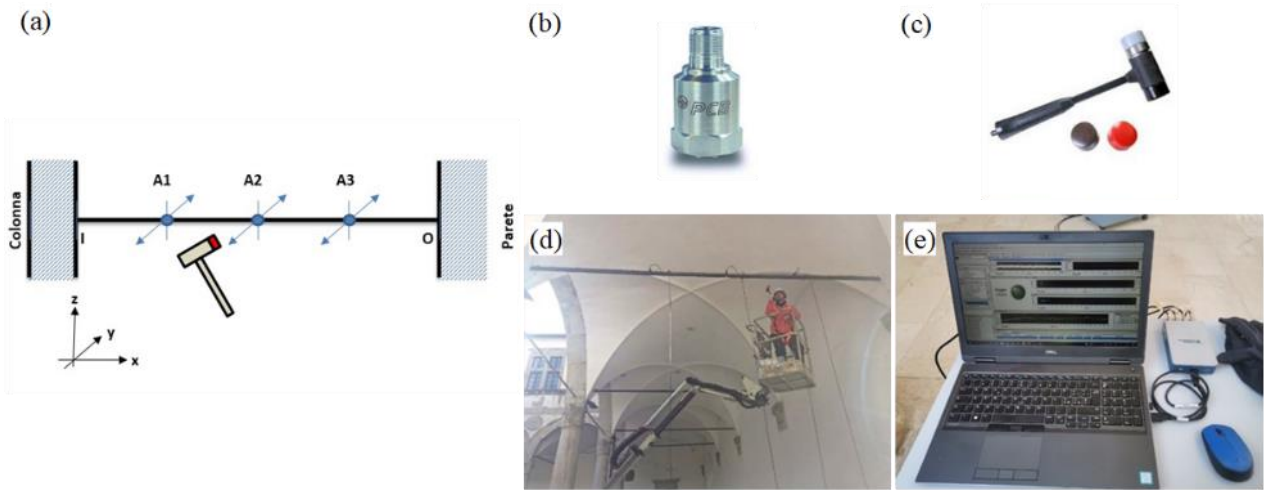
Impact Hammer Test: (a) sensors configuration, (b) accelerometer PCB 393A03, (c) hammer PCB 086D20, (d) execution step of the test and (e) acquisition system.
